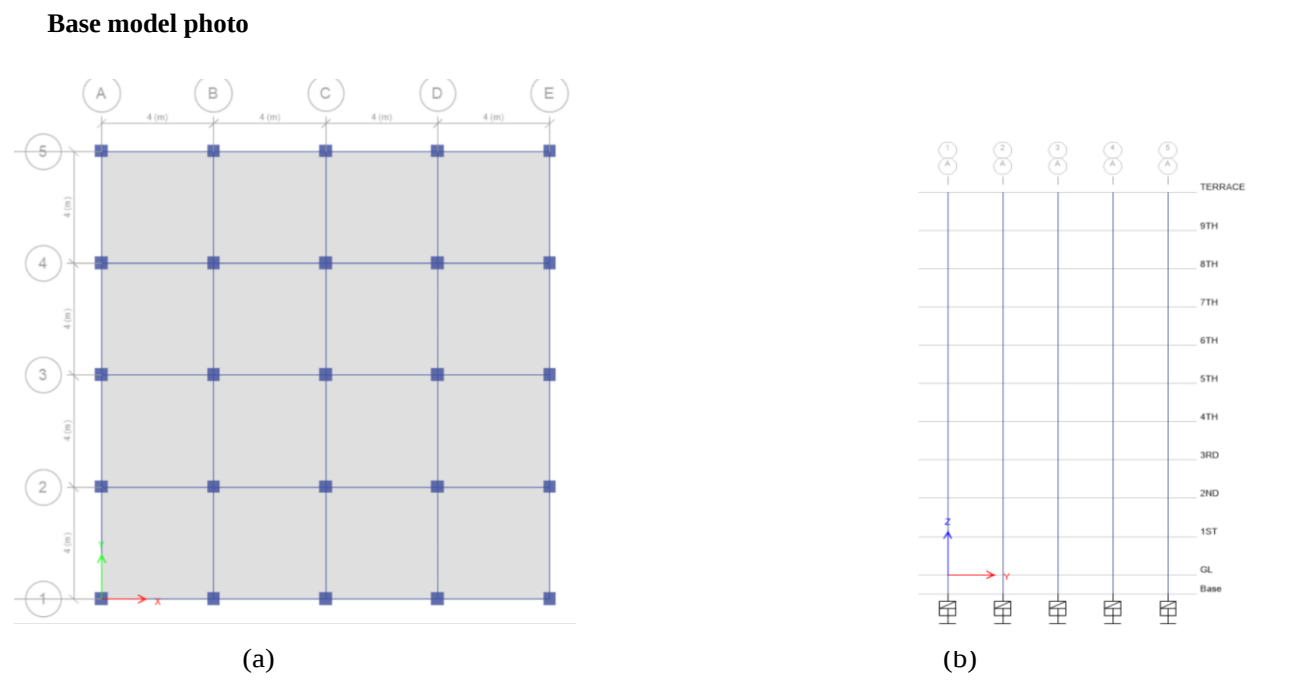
(a). Plan view and (b) Elevation view of 10 storey building
